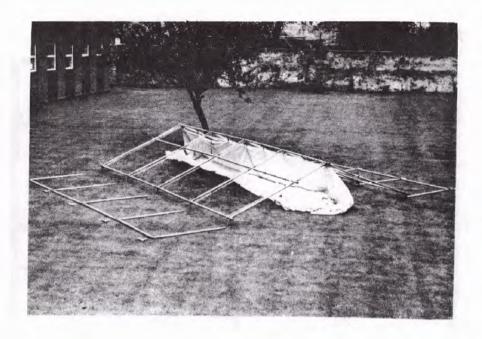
Lace the liner sections, two roof sections and two end sections (one end section with centre opening and one end section with passage doorway). Wall sections are not fitted at this stage. Fit the liner to the ridge poles.
